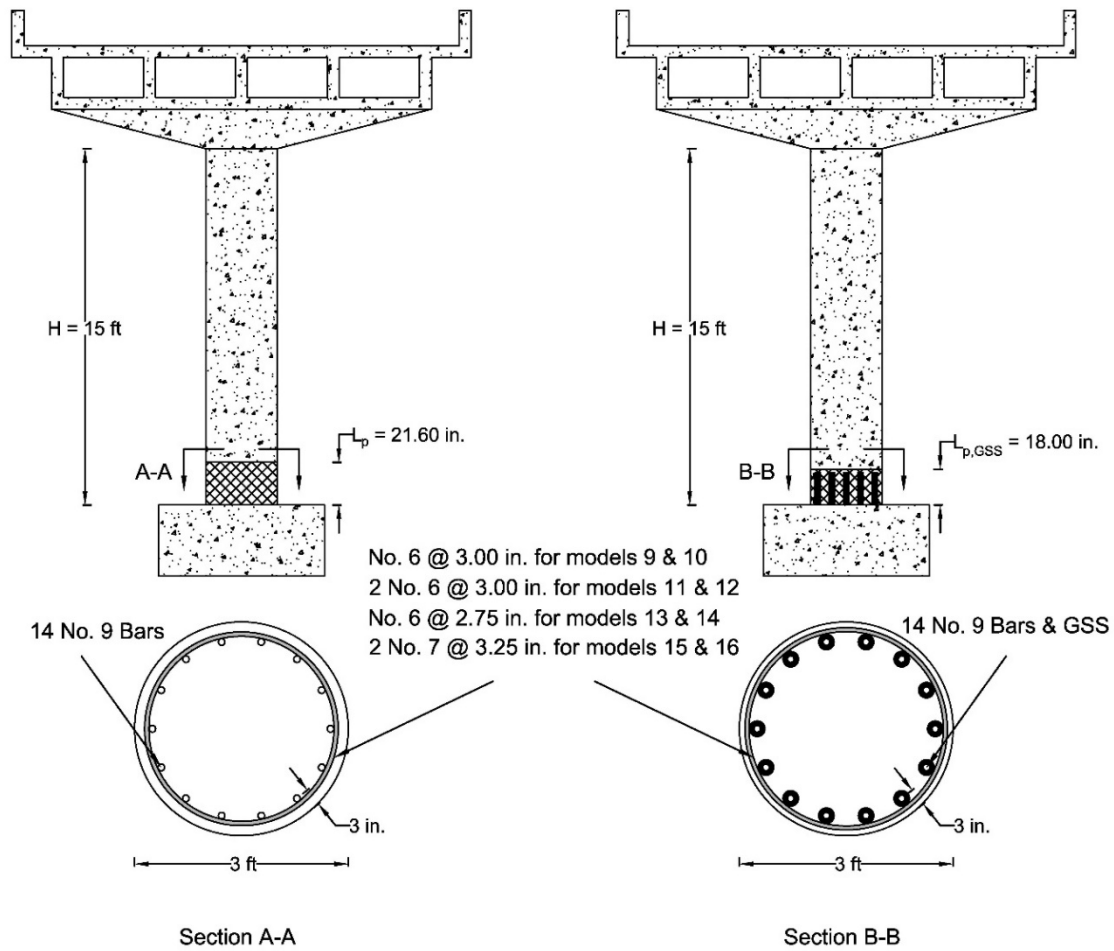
Details of column models with $H = 15 \text{ ft}$ and 14 No. 9 bars.
